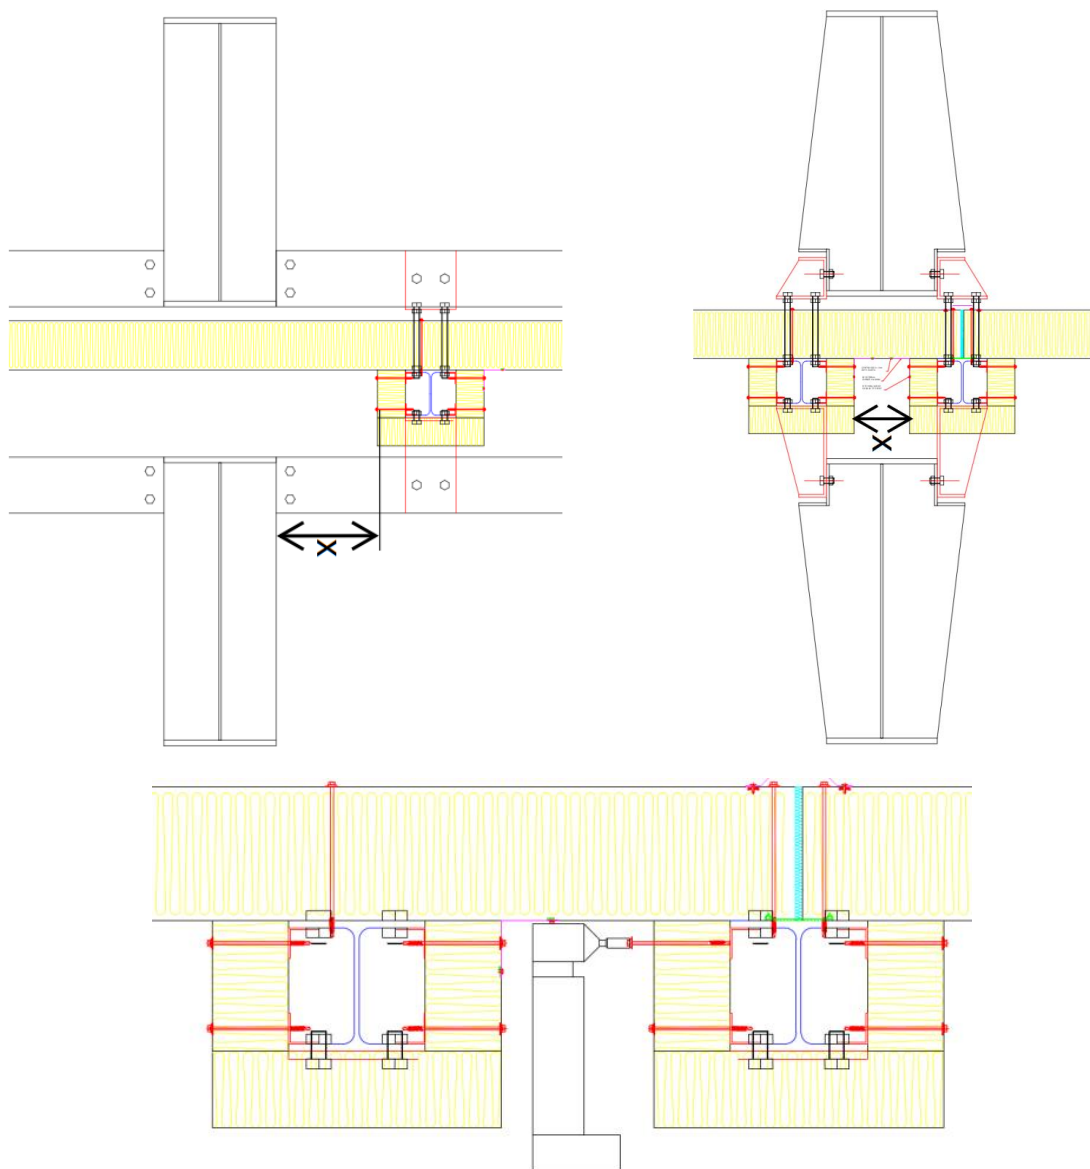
Spacing between the columns of the steel structure and the column encasement system of the wall
